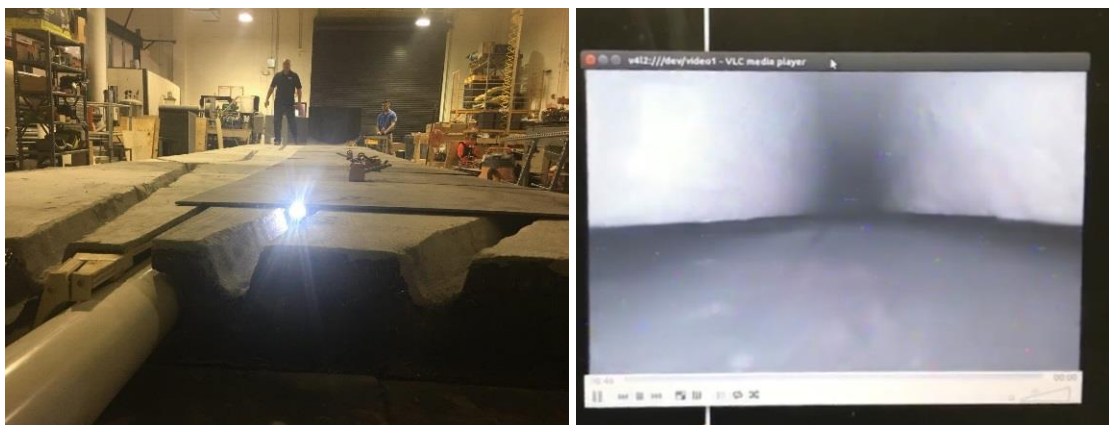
Demonstration of the mini inspection tool traversing from the entry to the end of the mockup (left) and image/video captures from the mini inspection tool’s onboard camera (right).
